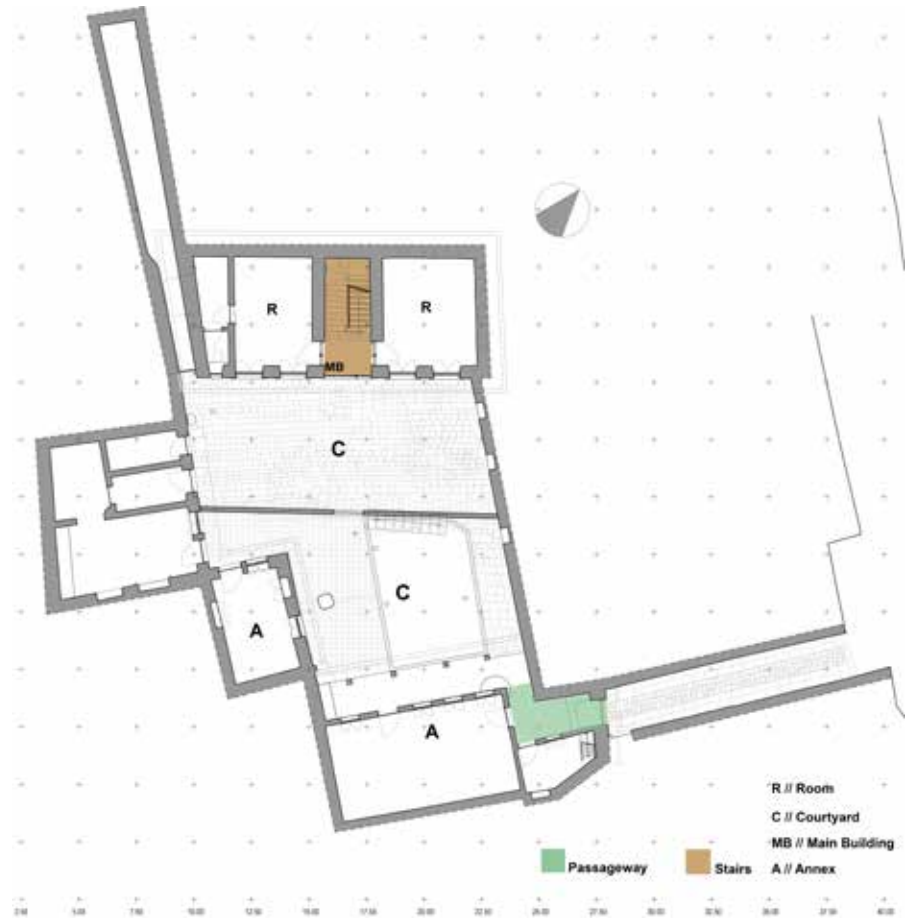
The Mutasarrıf Hacı Müminzade İbrahim Edhem Bey house ground floor plan scheme (Prepared by the author, 2021).
